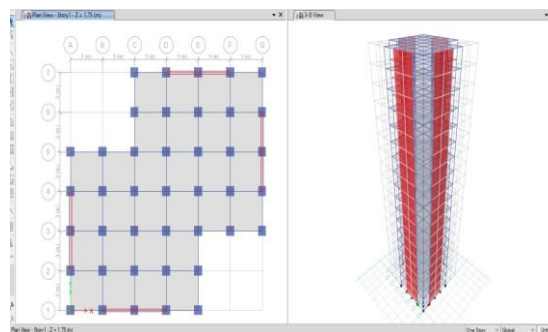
SHEAR WALL AT MIDDLE FOR IRREGULAR BUILDING
